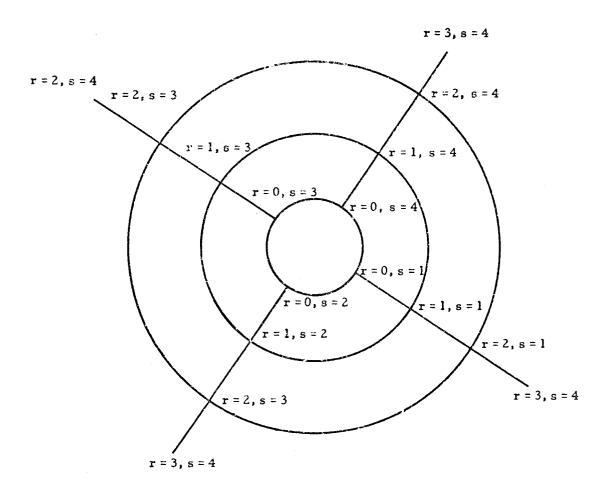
DOME BRIDGE, PLAN VIEW
